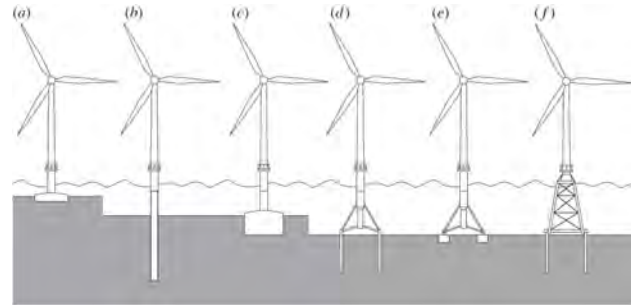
WTG foundation concepts (a) gravity-based foundation (b) monopile foundation (c) caisson foundation (d) multipile foundation (e) multi caisson foundation and (f) jacket foundation (Kallehave et al., 2015)
